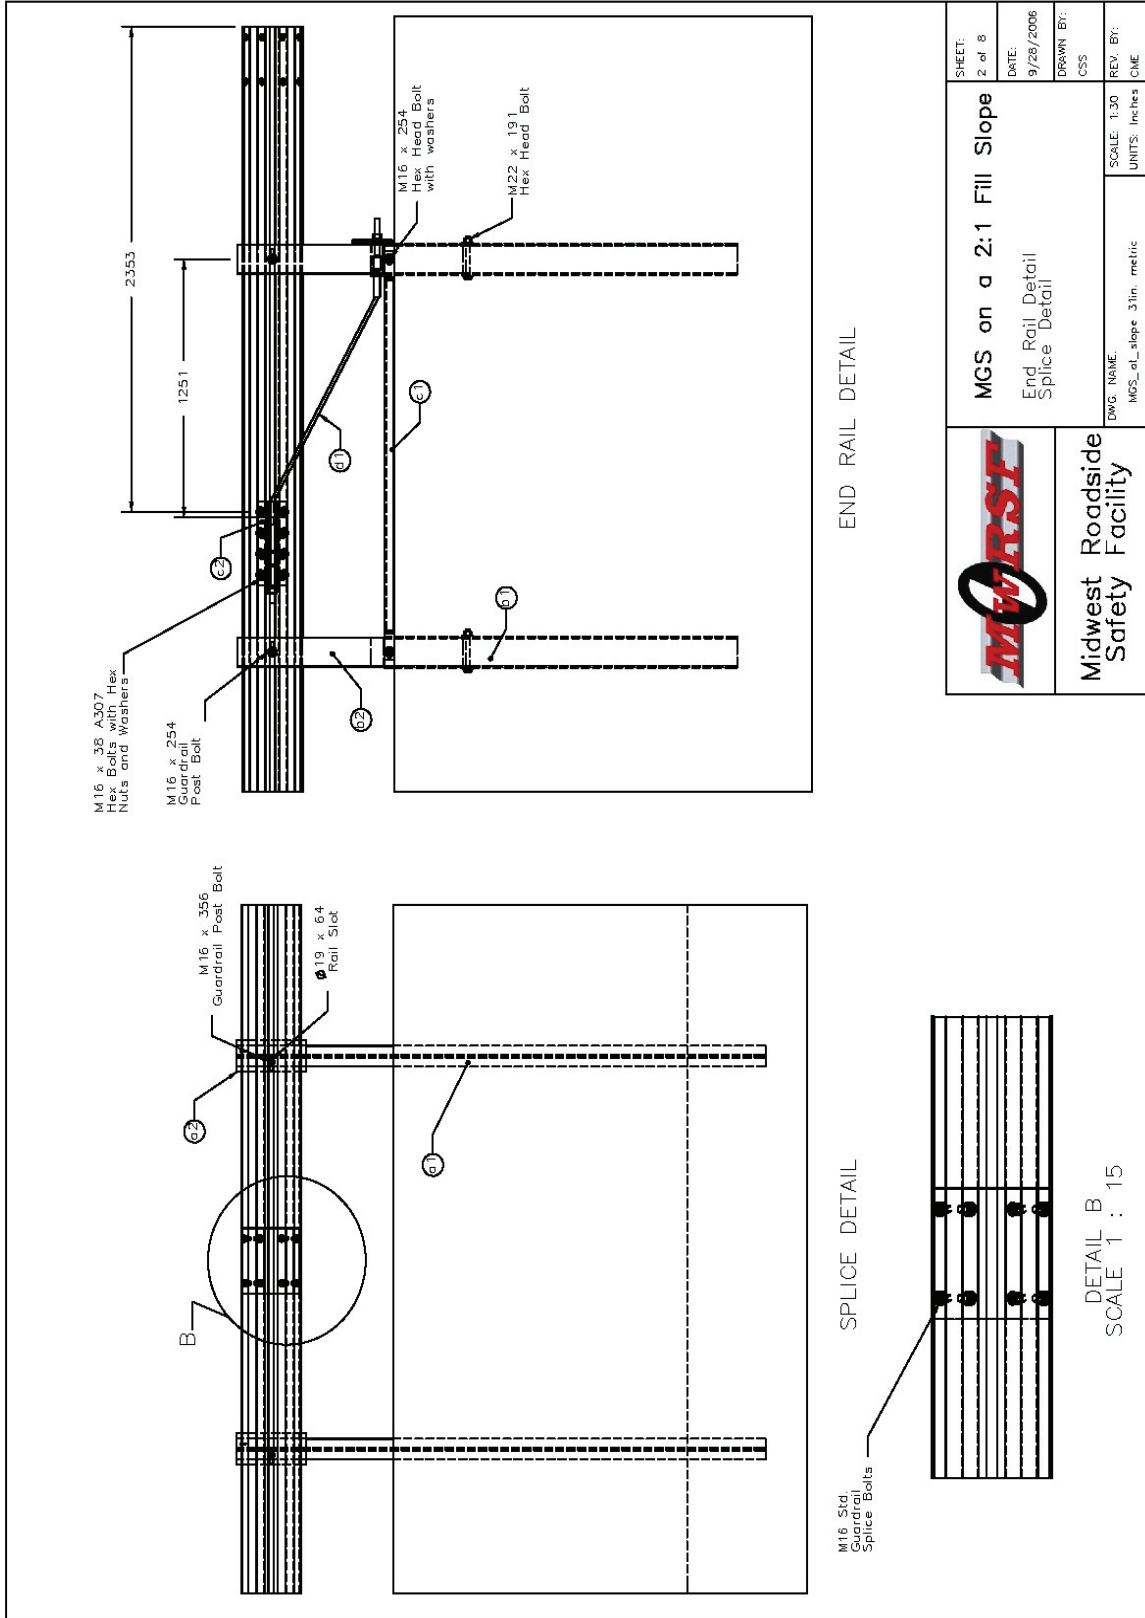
Rail Detail, Test No. MGS221-2 (Metric)
